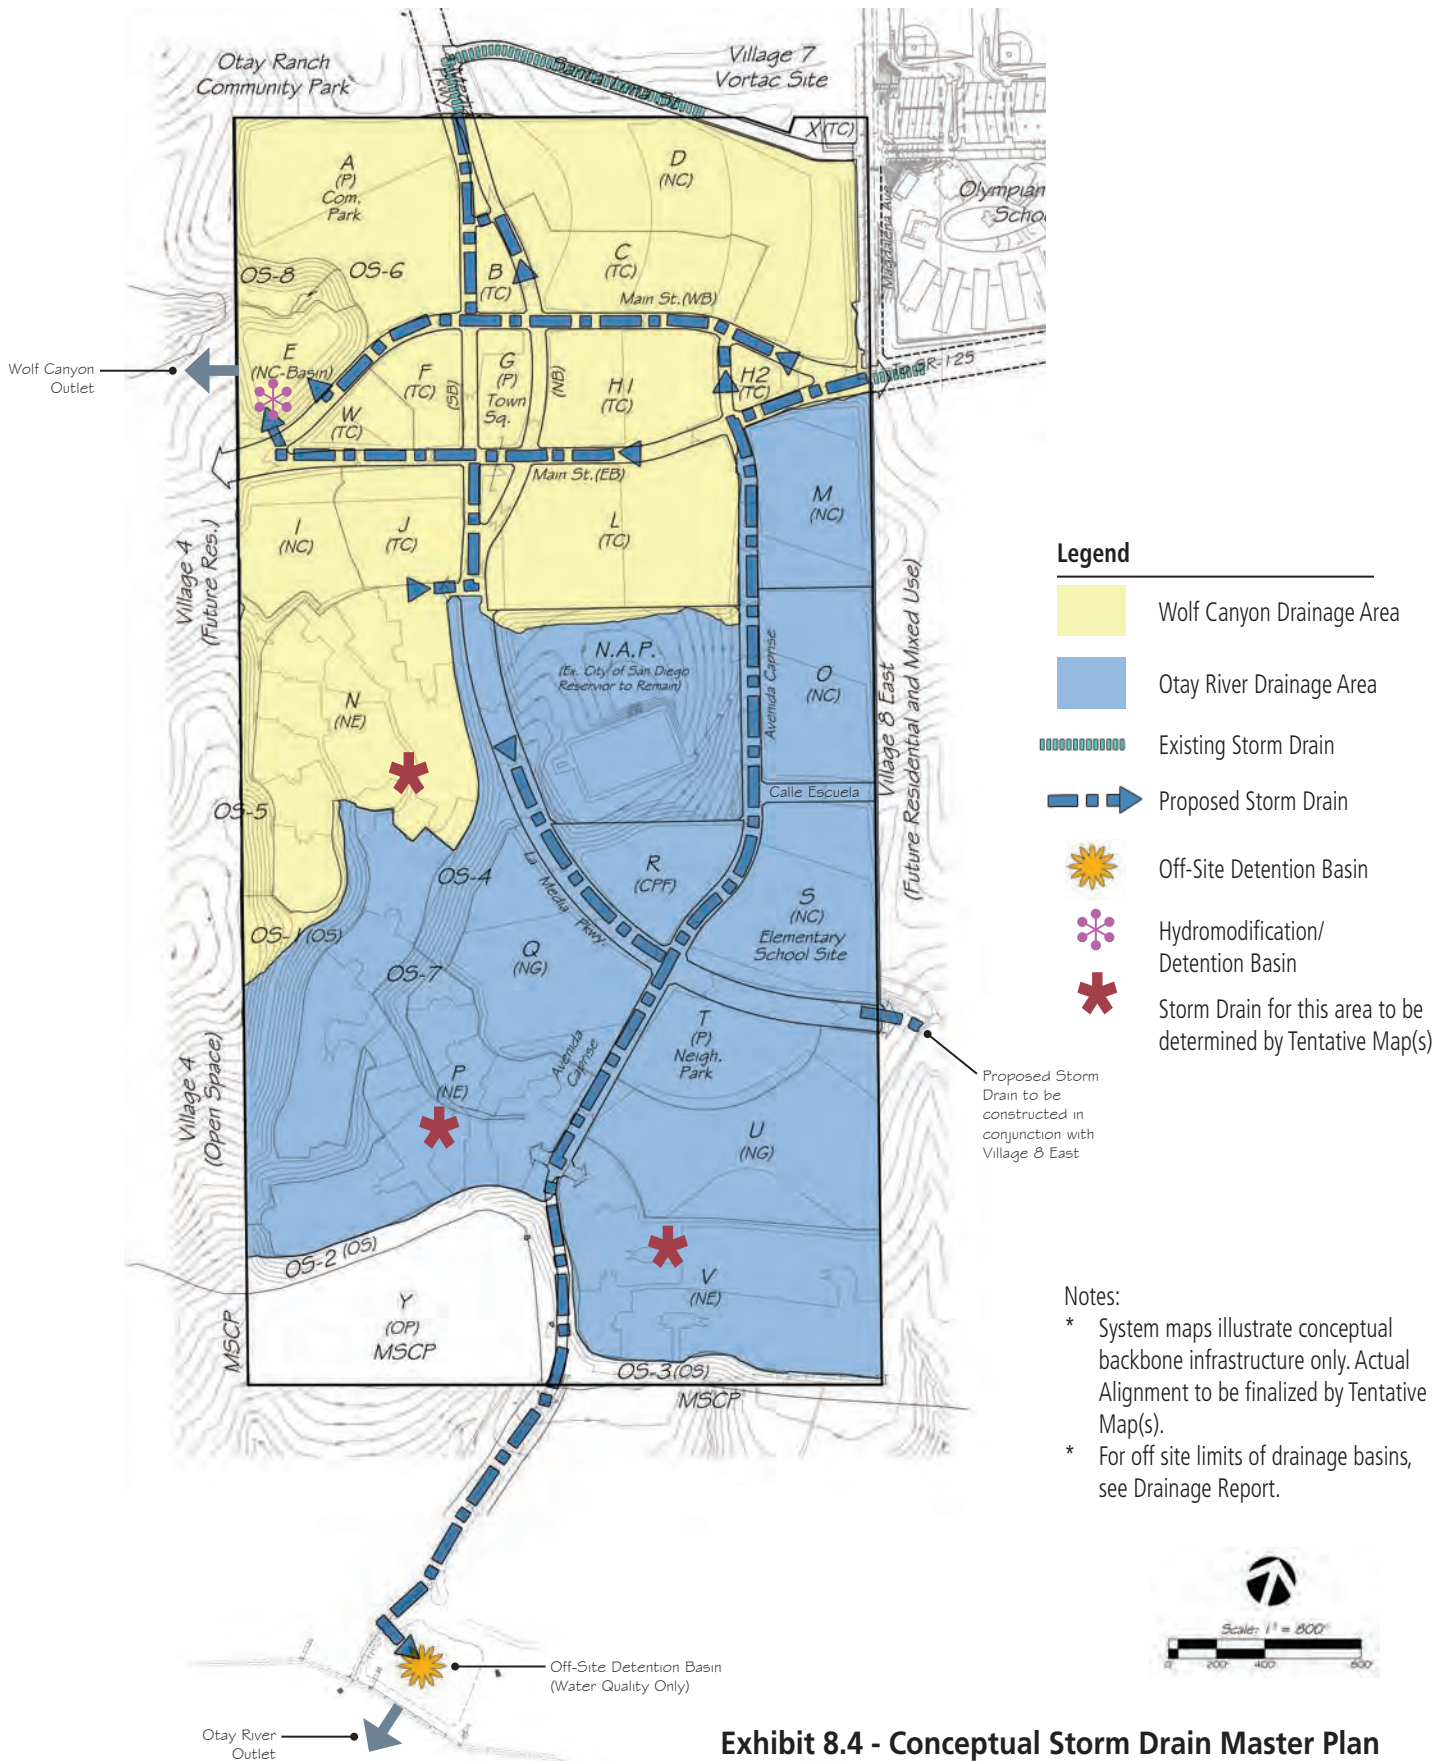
Conceptual Storm Drain Master Plan
